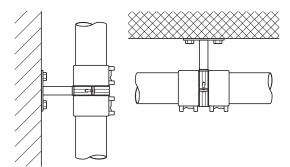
Vertical and horizontal anchor-point fastening with a pipe bracket on the pipe with 2 Geberit electrofusion couplings
